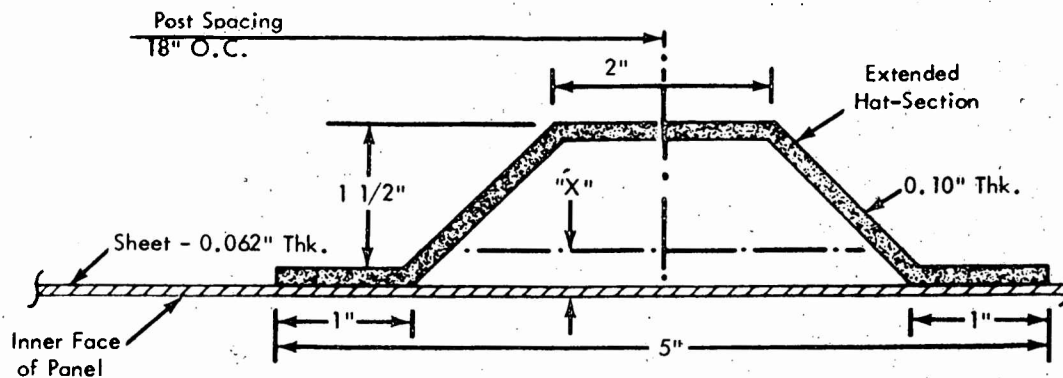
Typical Arrangement of Members in Sheet and Post Panel Designs
